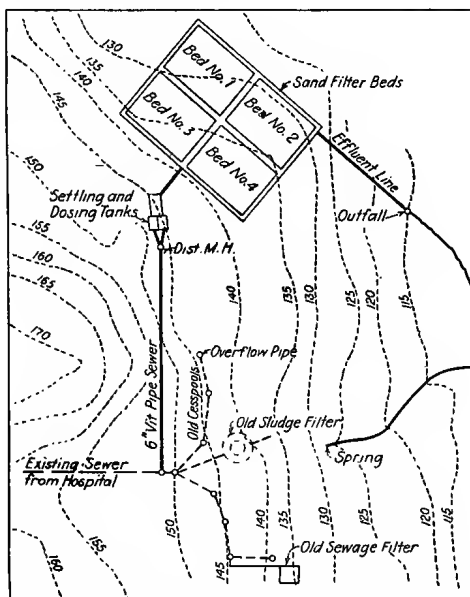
General plan of sewage-disposal plant at Norfolk County Hospital, Braintree, Mass.
